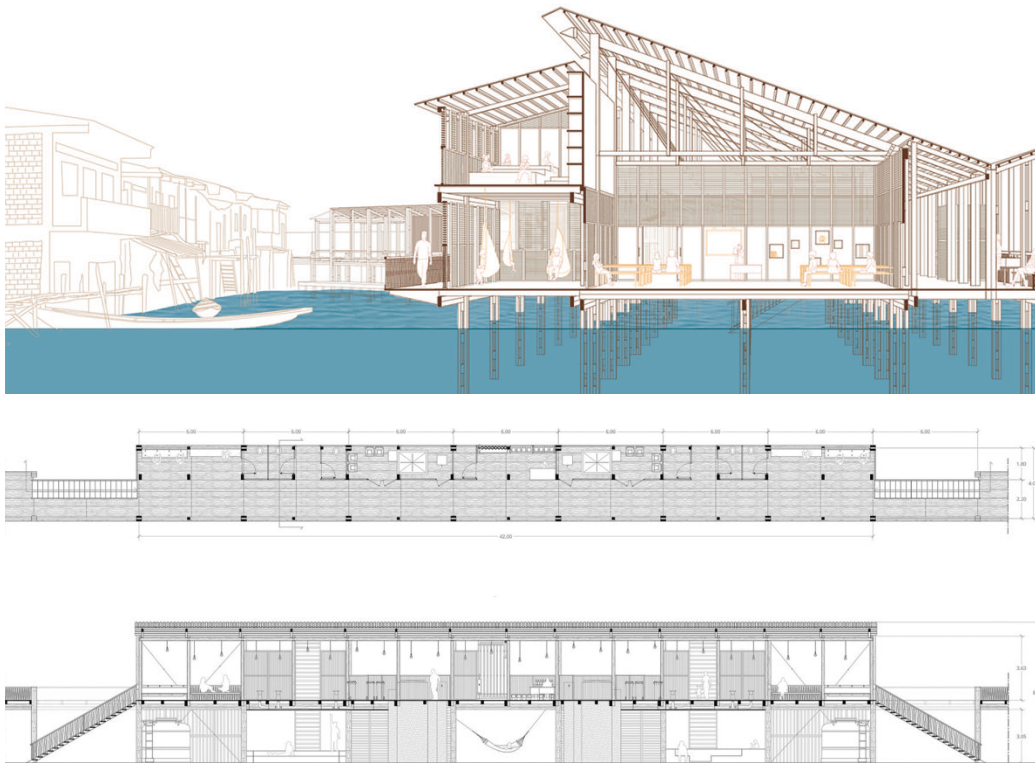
, 13 | Classroom / Meeting room: Perspective section; Plan and longitudinal section of the service module.
